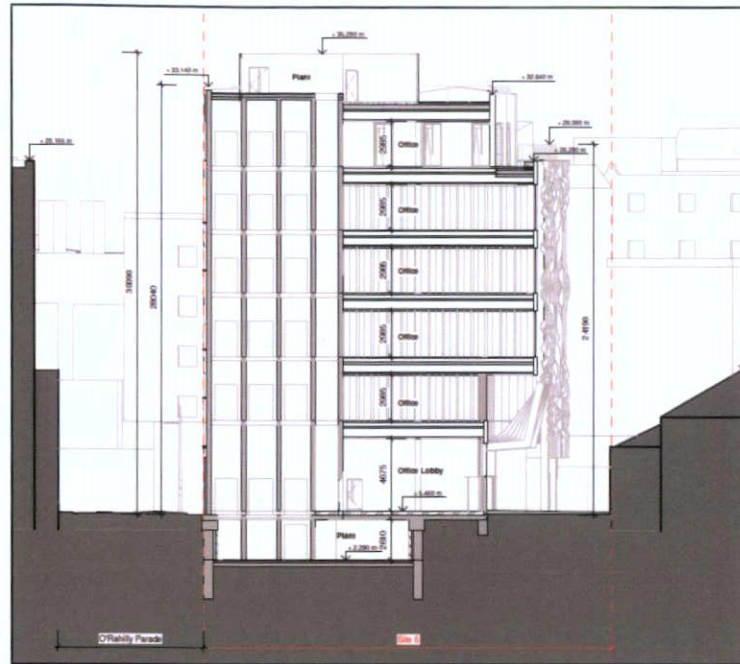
Cross section through Site 5 from O'Rahilly Parade to the north to Site 5 to the south.
